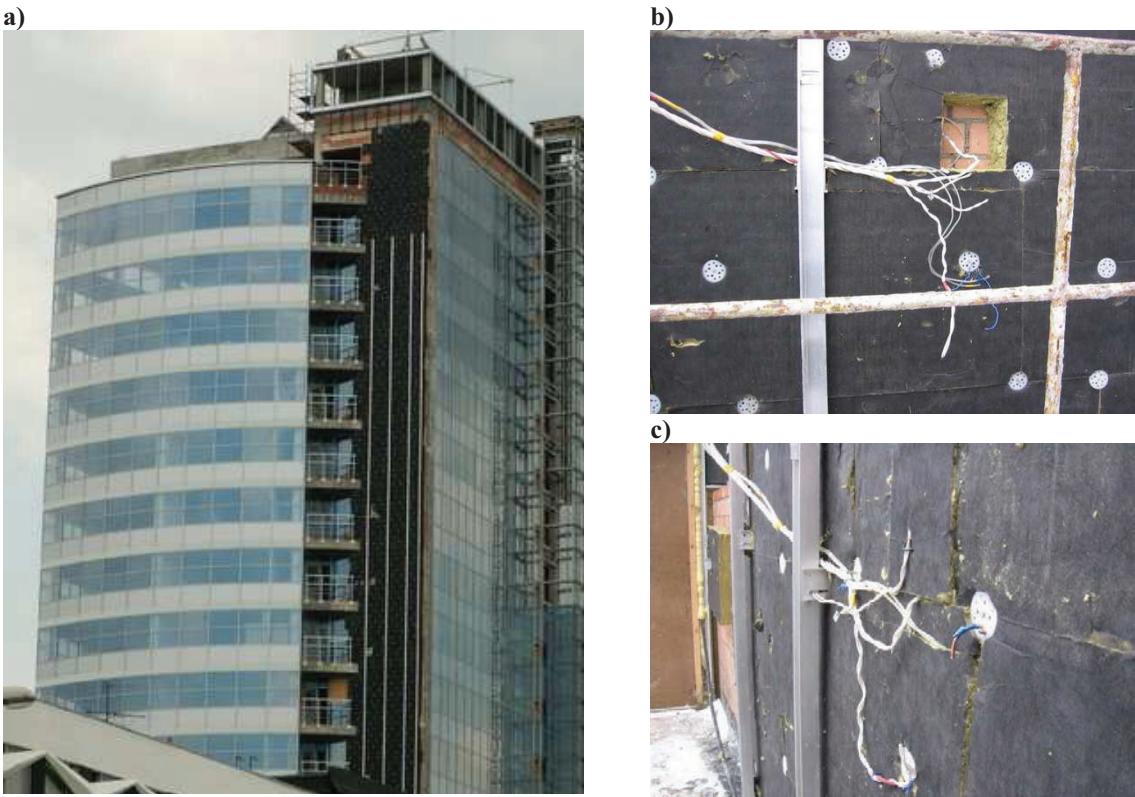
Test position on the building wall with VFS (Minsk, Nezavisimosti Ave.):
